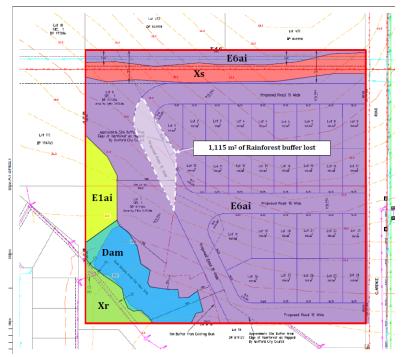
Early Proposed Concept Subdivision Layout Suggested as part of Planning Proposal
